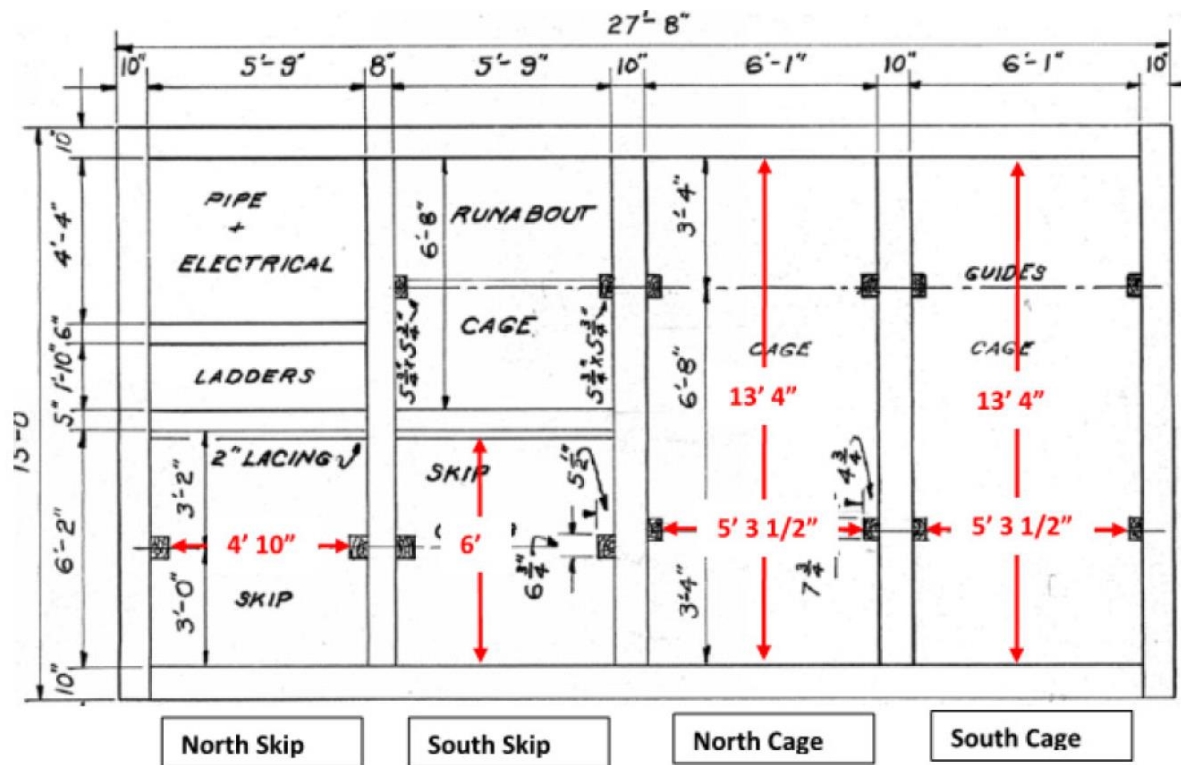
Yates Shaft Plan View – Typical Set Compartment Layout.
